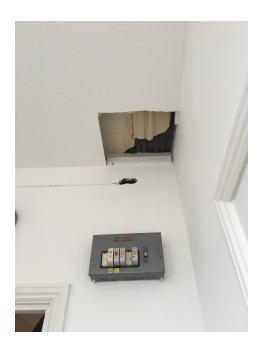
False ceiling covering up original coving that was added in the 1970s conversion within the internal hallway. Proposed plans will not impact on the corincing.
